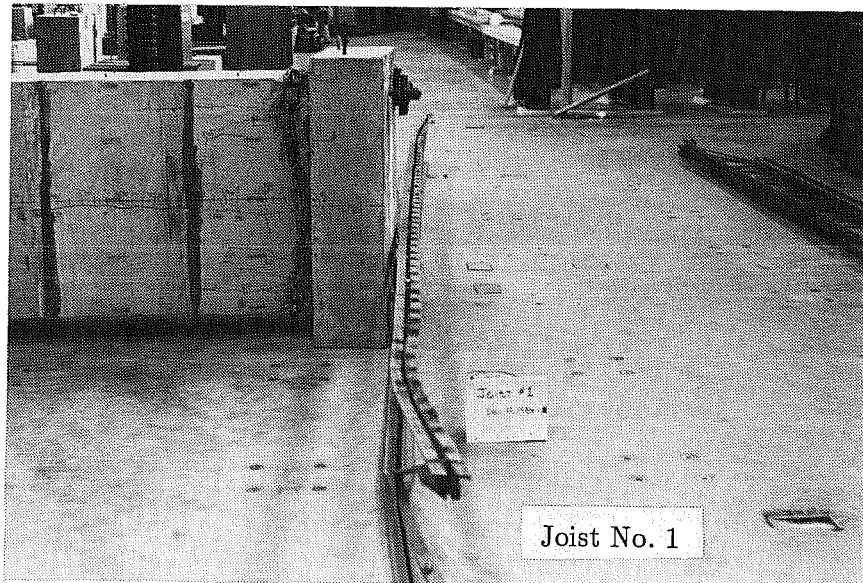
Photographs of Joists as Received at Ferguson Lab
